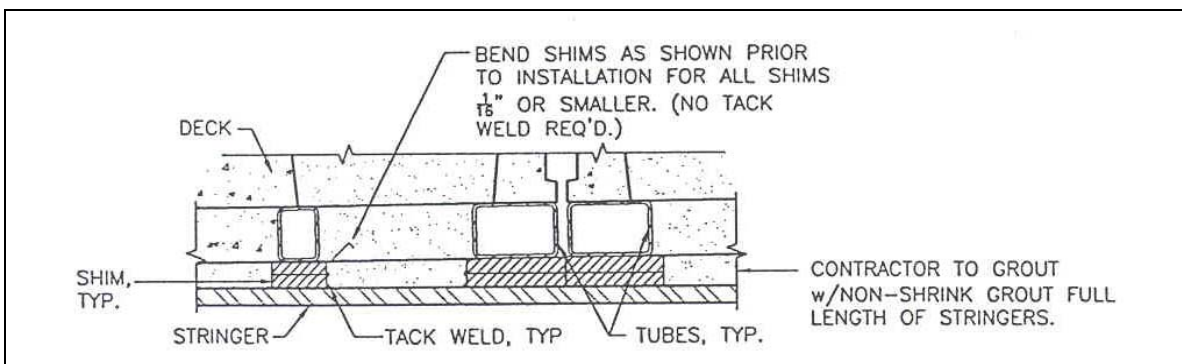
Typical shim detail for bridge over Cascadilla Creek, Ithaca, NY (The Fort Miller Co., Inc., 2001)
